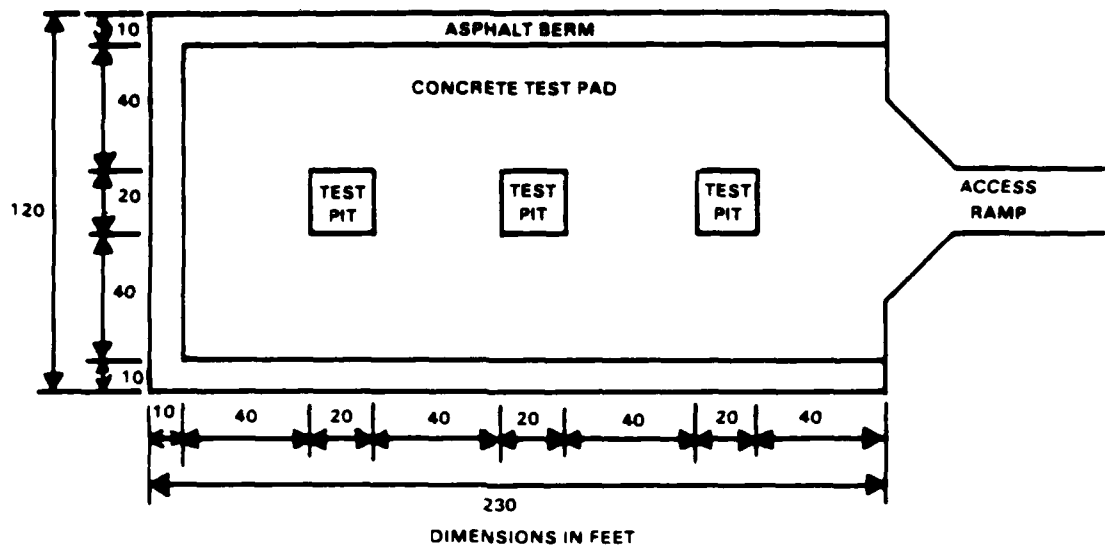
Plan View of Small-Crater Test Facility (SCTF).
